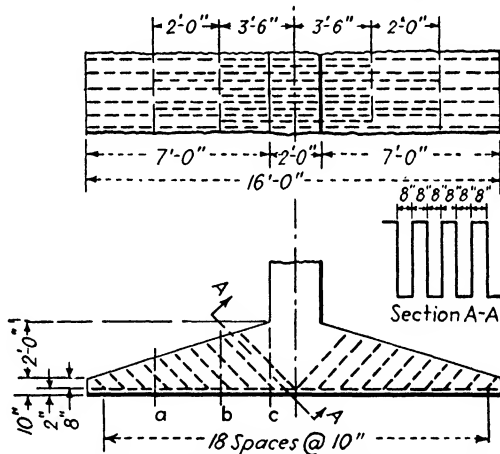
Reinforced-concrete Wall Footing.
